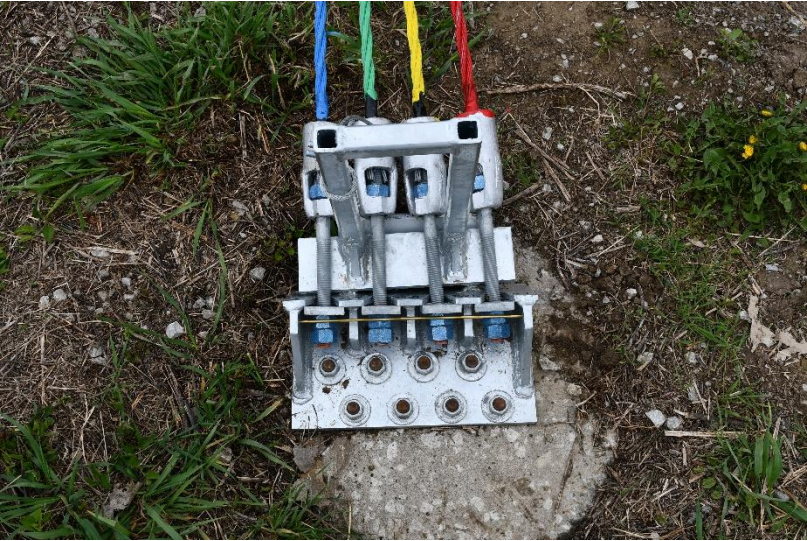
System Installation – Downstream Anchorage, Test No. MTP-1
